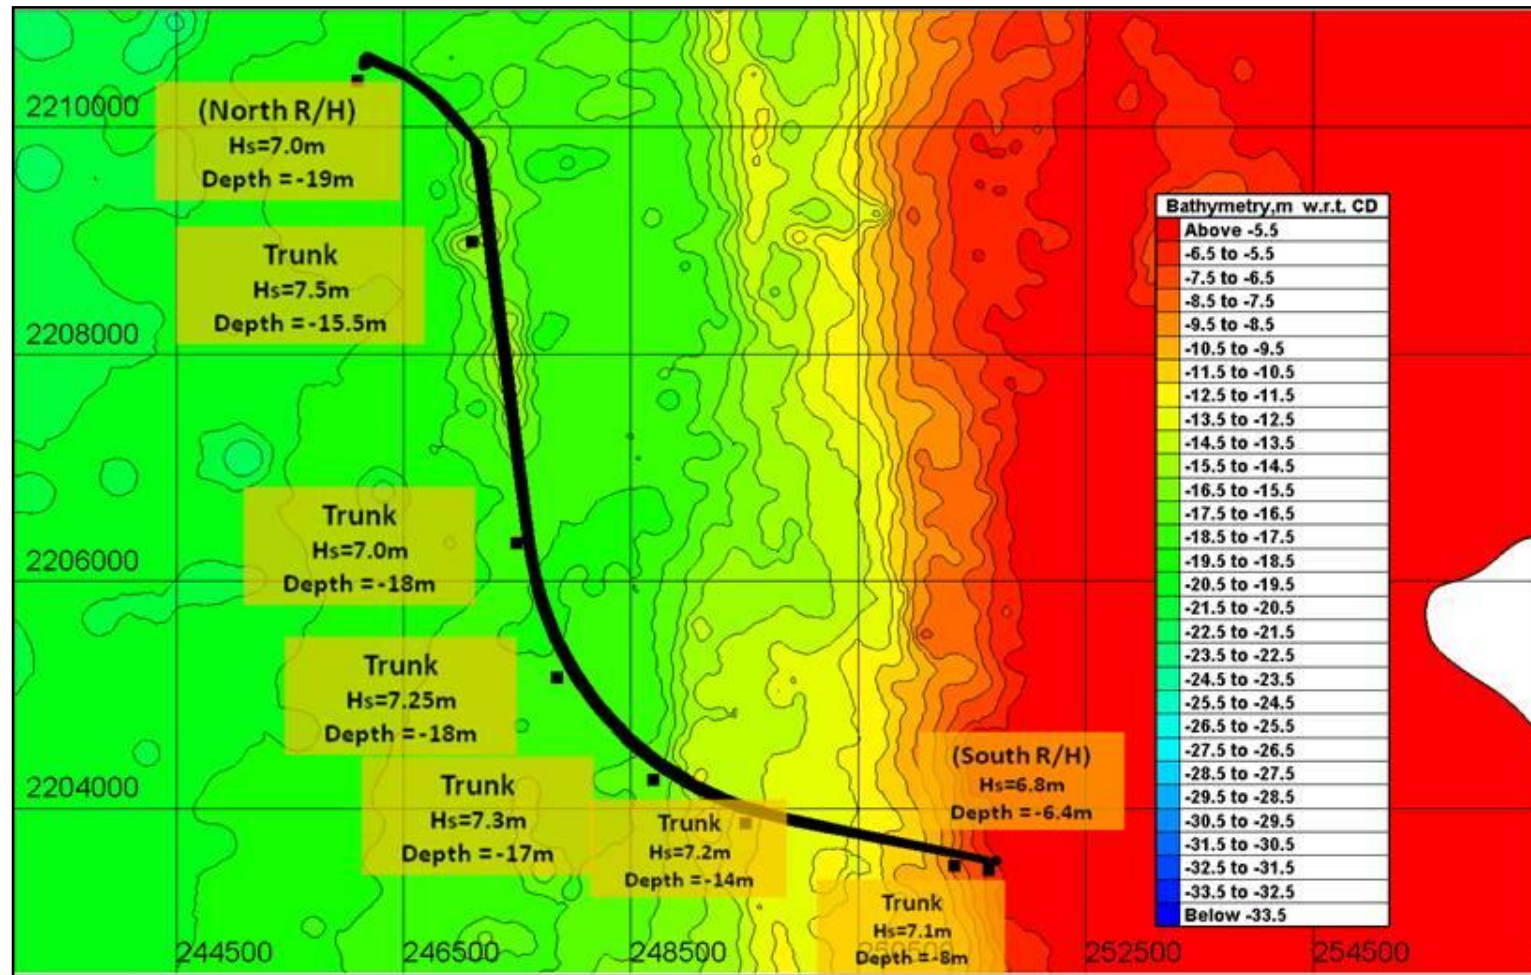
Layout plan of breakwater with Significant wave height at different bed level for the development of Port at Vadhavan, Maharashtra
